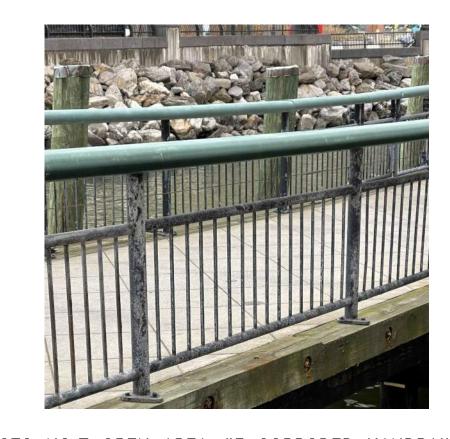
OPEN AREA #3 CORRODED HANDRAILS
